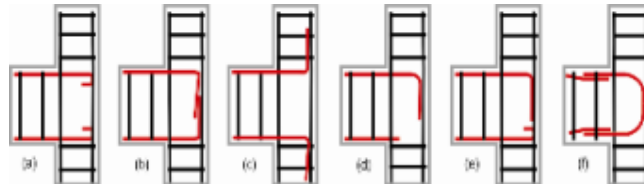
Different configuration of beam long. reinforcement anchorage into joint zone (NZSEE et al., n.d.-a)
